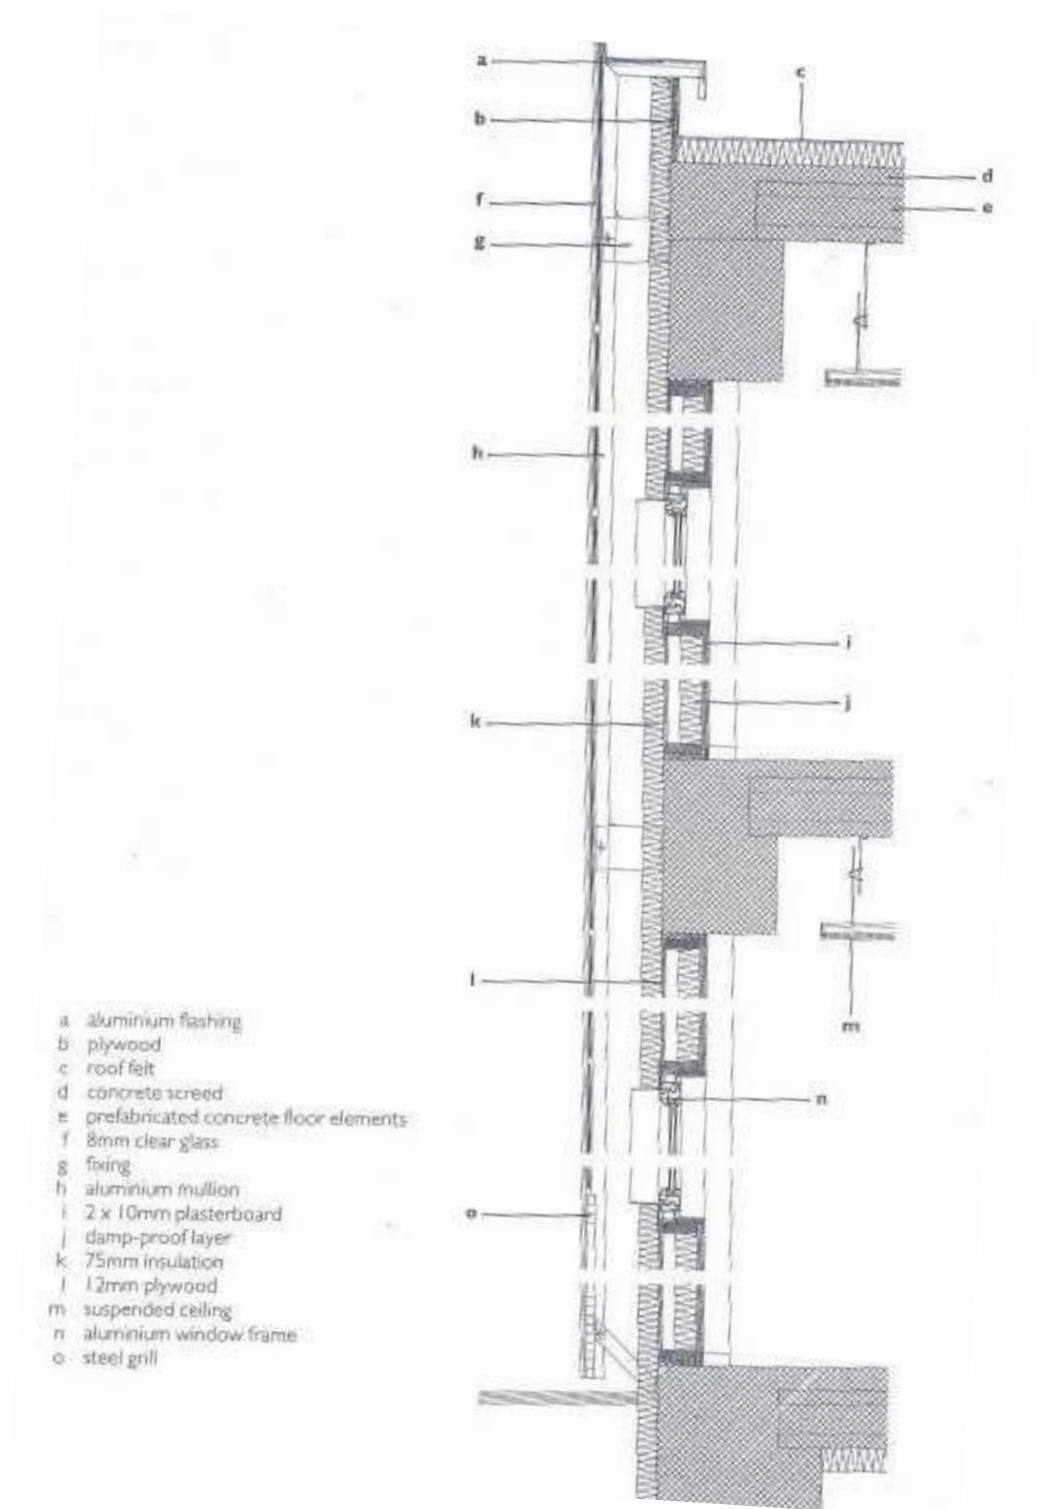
Section through the glass envelope around the School of Fashion and Graphic Design, Utrecht
